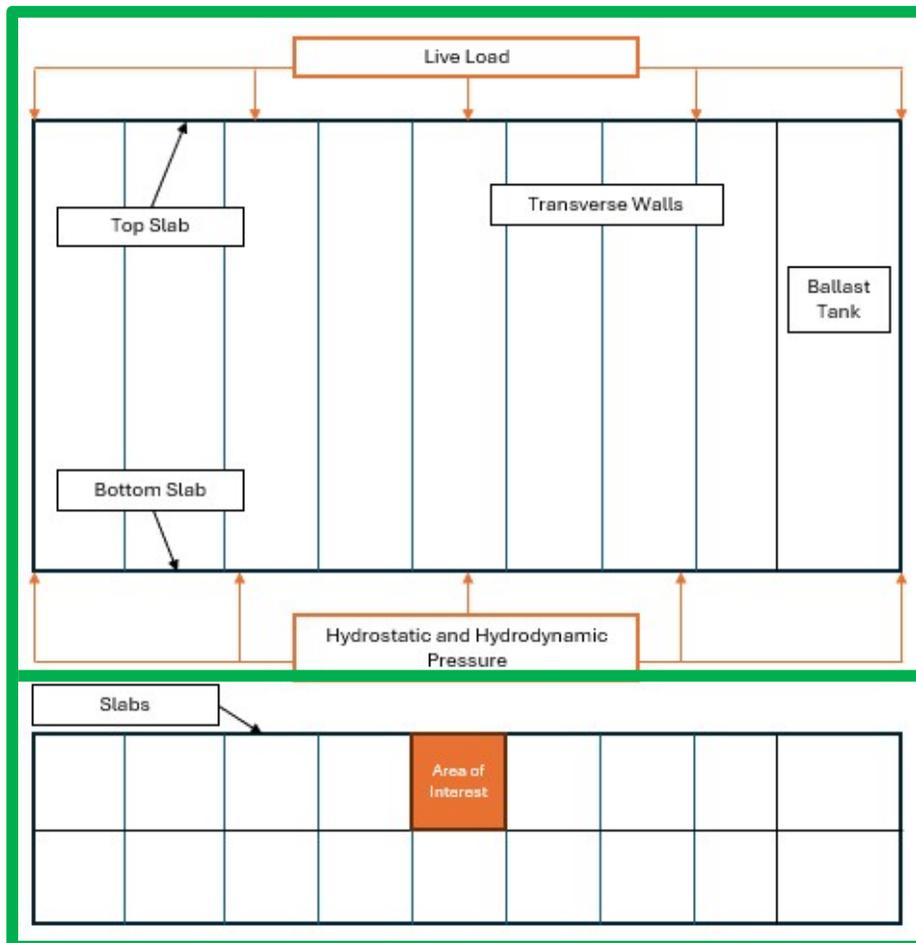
(top) Elevation view of single leg of the concrete foundation and (bottom) plan view of the internal and external walls
